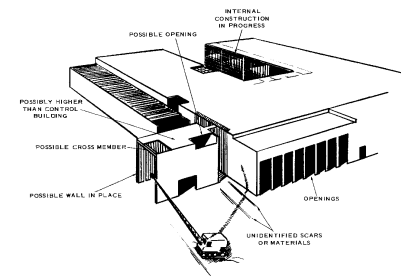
PERSPECTIVE VIEWS OF RIGHT SUSPECT TRANSMITTER HOUSE AND CONTROL BUILDING UNDER CONSTRUCTION AT MISHELEVKA DUAL HEN HOUSE D.
